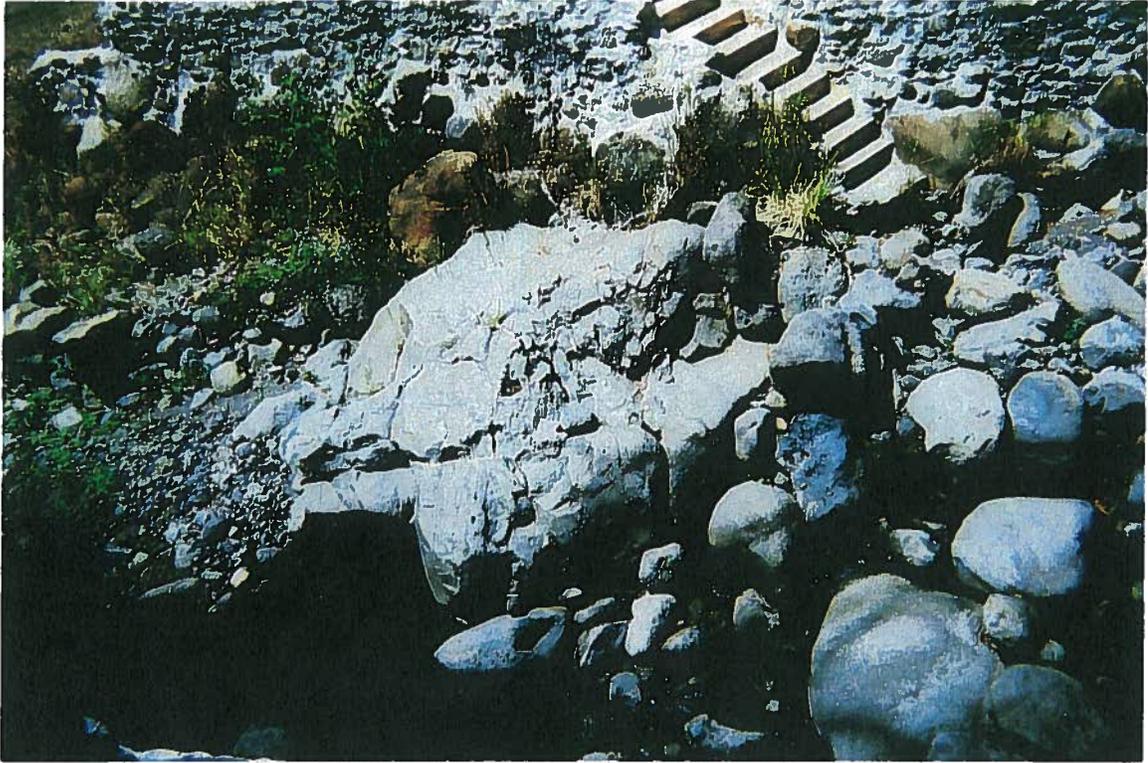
View of large rock in streambed where applicant will grout rocks and boulders in stream bed to.
